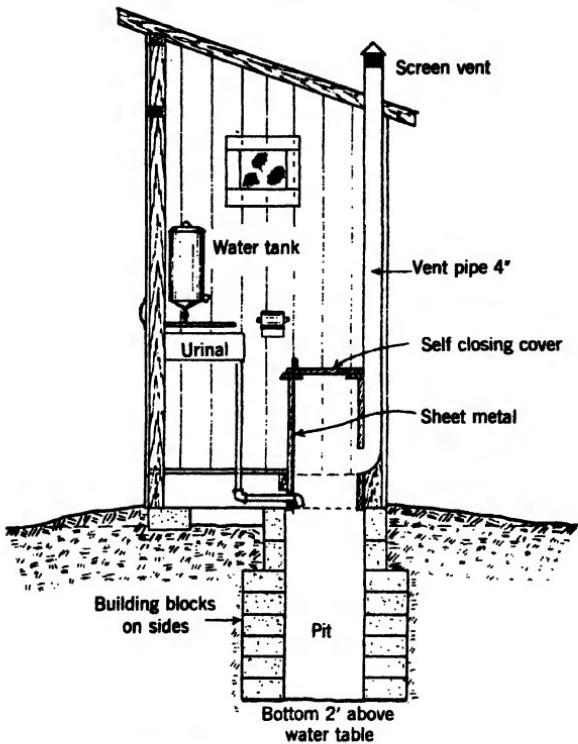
Plan for a sanitary pit privy with concrete floor.
